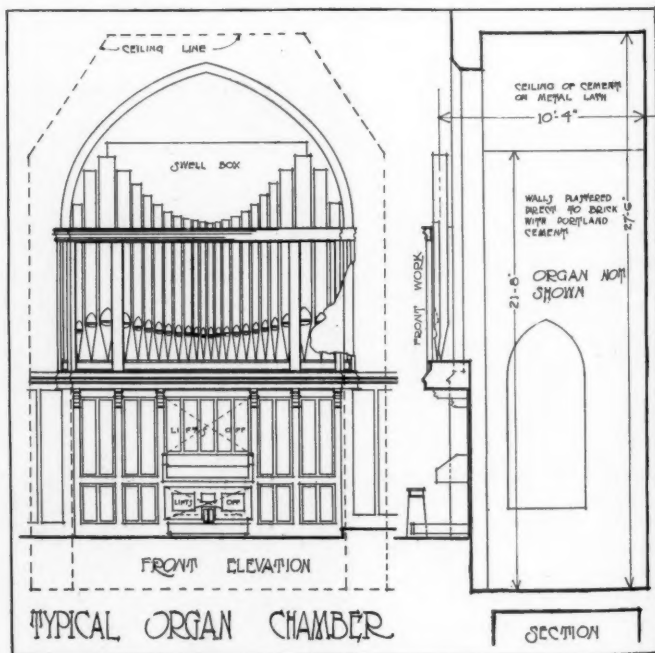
FRONT ELEVATION AND SECTION OF ORGAN CHAMBER
